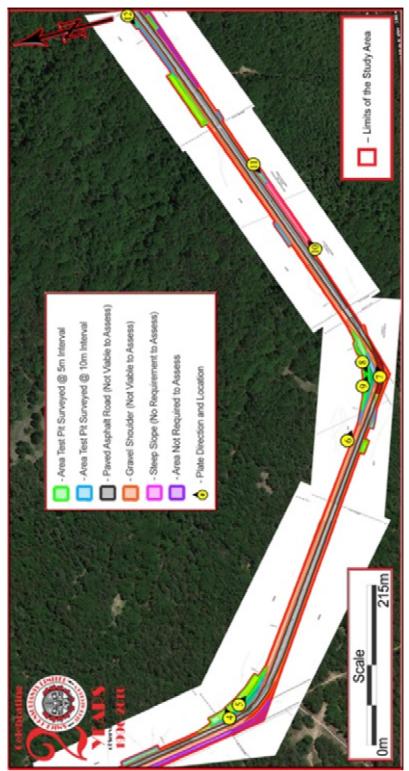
DETAILED PLAN OF THE STUDY AREA
